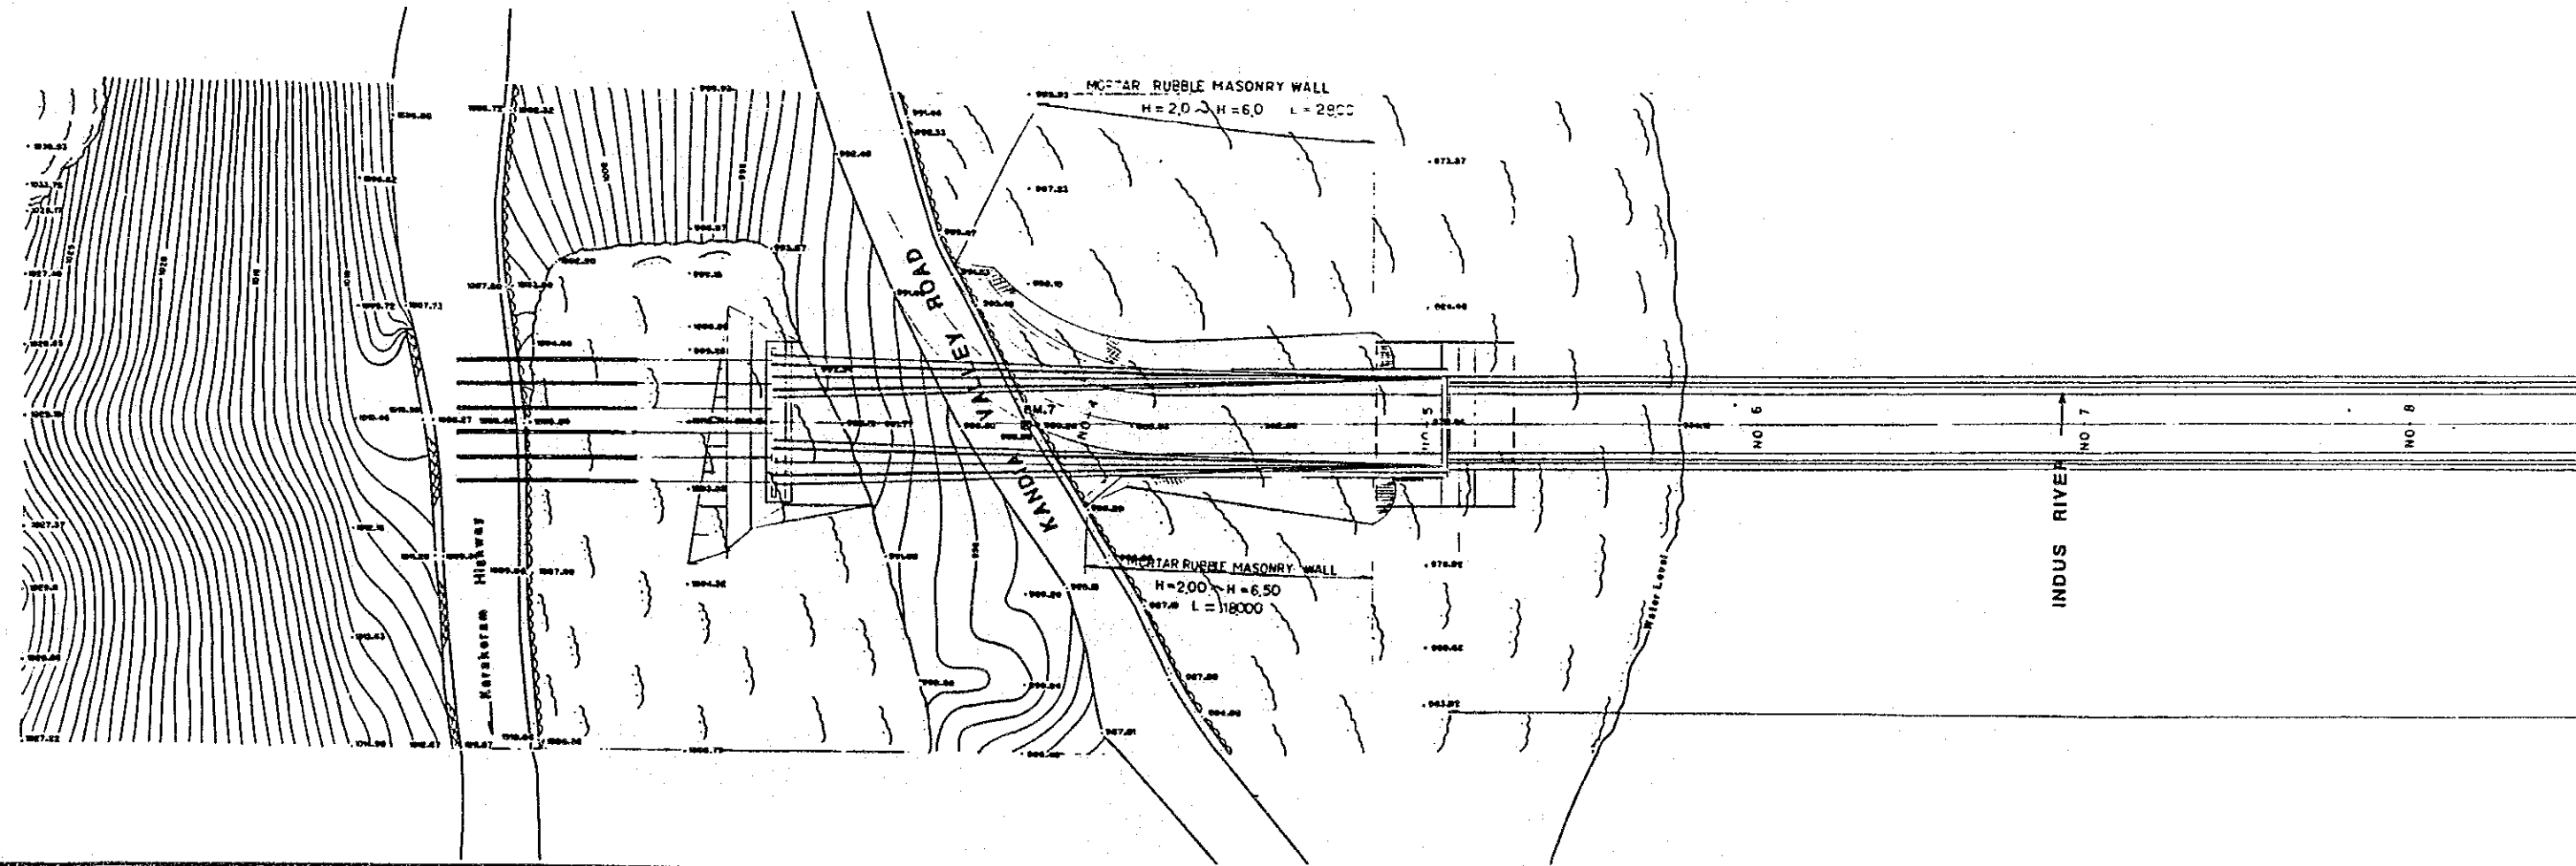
(2) General Layout Plan of the No.5 Pashorai Bridge (2/2)
